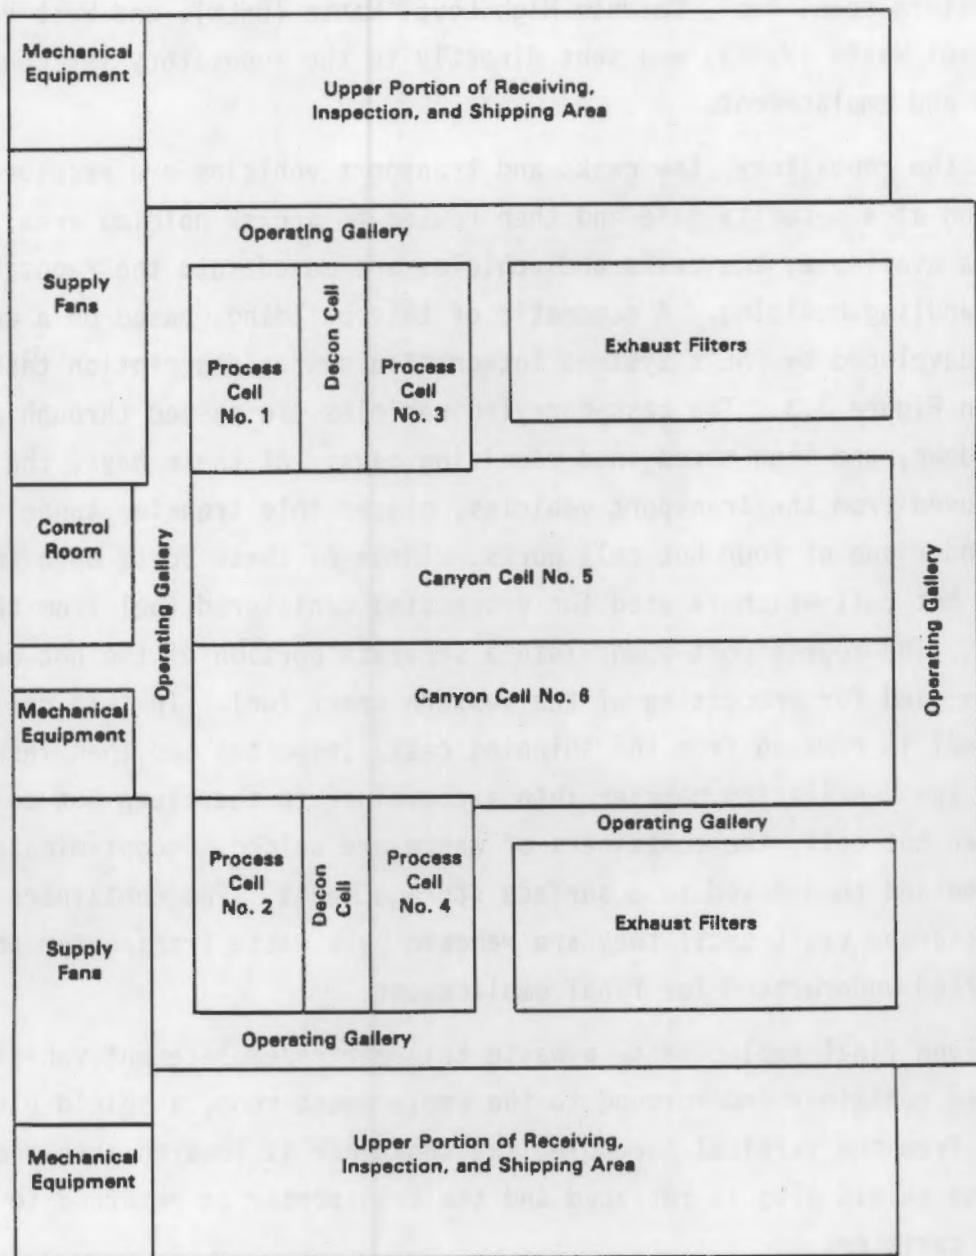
Schematic First-Level Plan for the MRS Receiving and Handling Building
